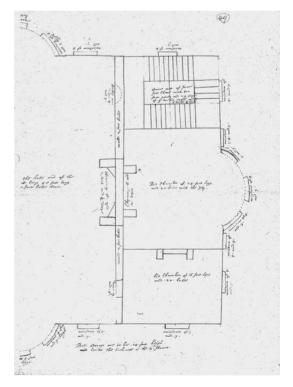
Lamport Hall. Papillon's plan for an extension to the existing house. (Northamptonshire County Record Office, IL30799 A49)
